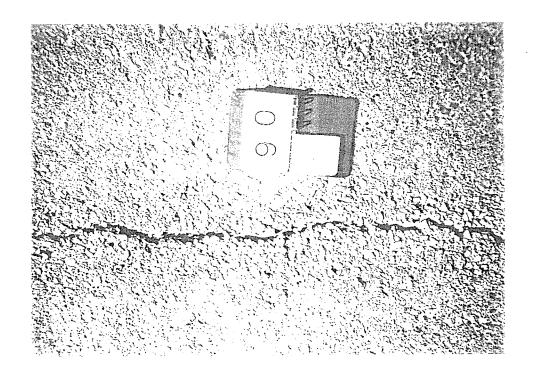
Crack of Photo 3.13 After Sandblasting
